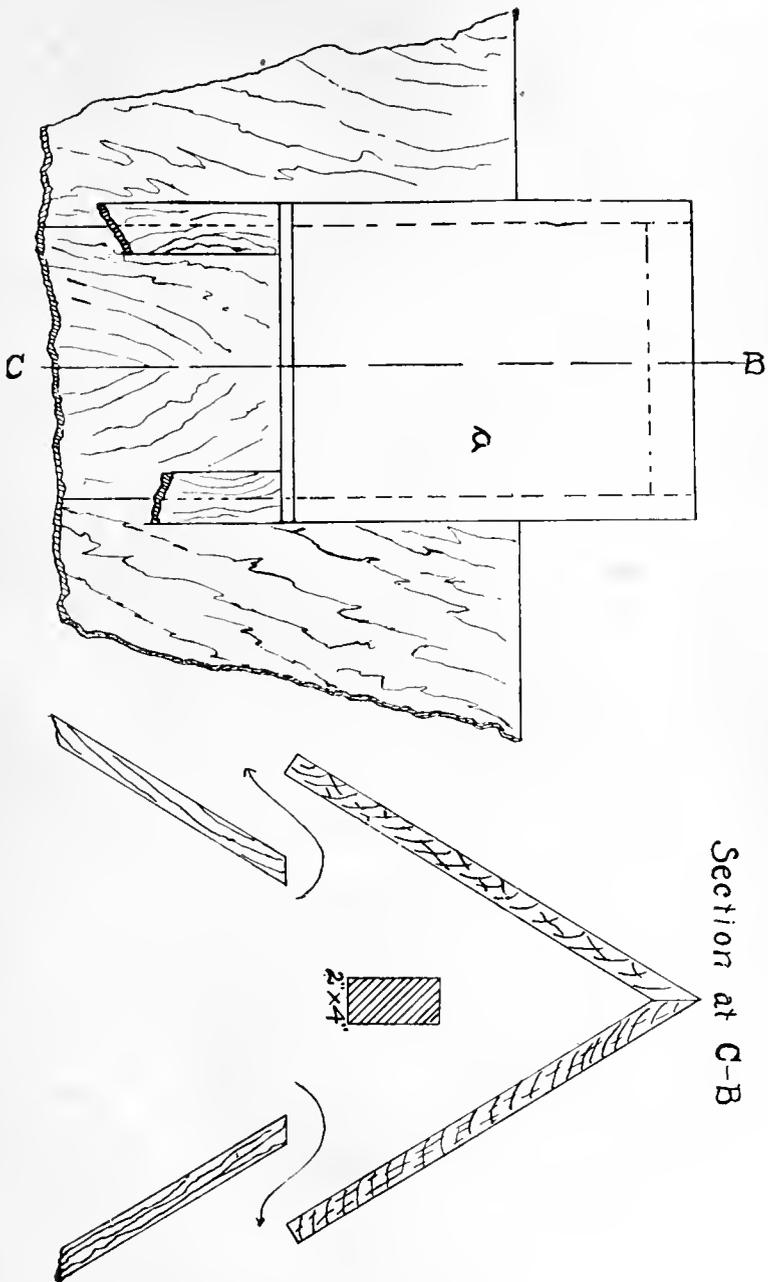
Ventilator, Side Elevation and Cross Section.
